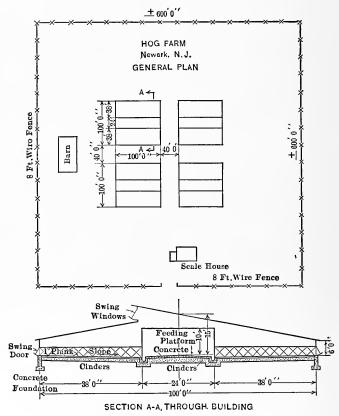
General Plan and Section of Hog Farm, Newark, N. J.
